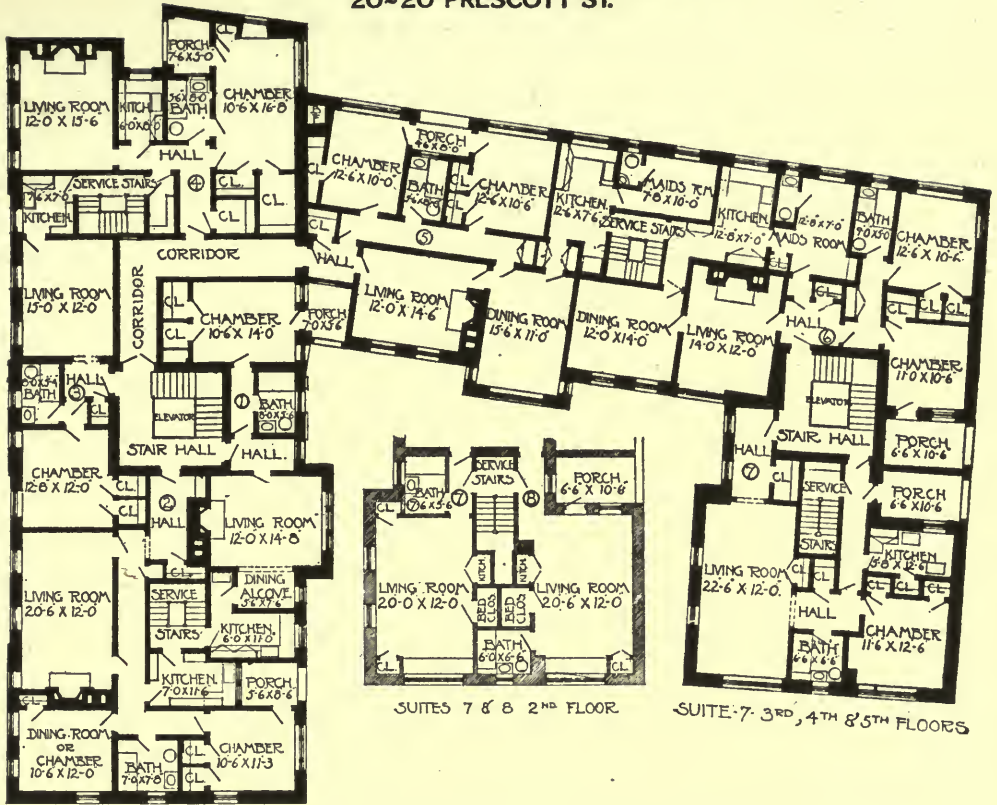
TYPICAL FLOOR PLANS, CAMBRIDGE, MASS.
